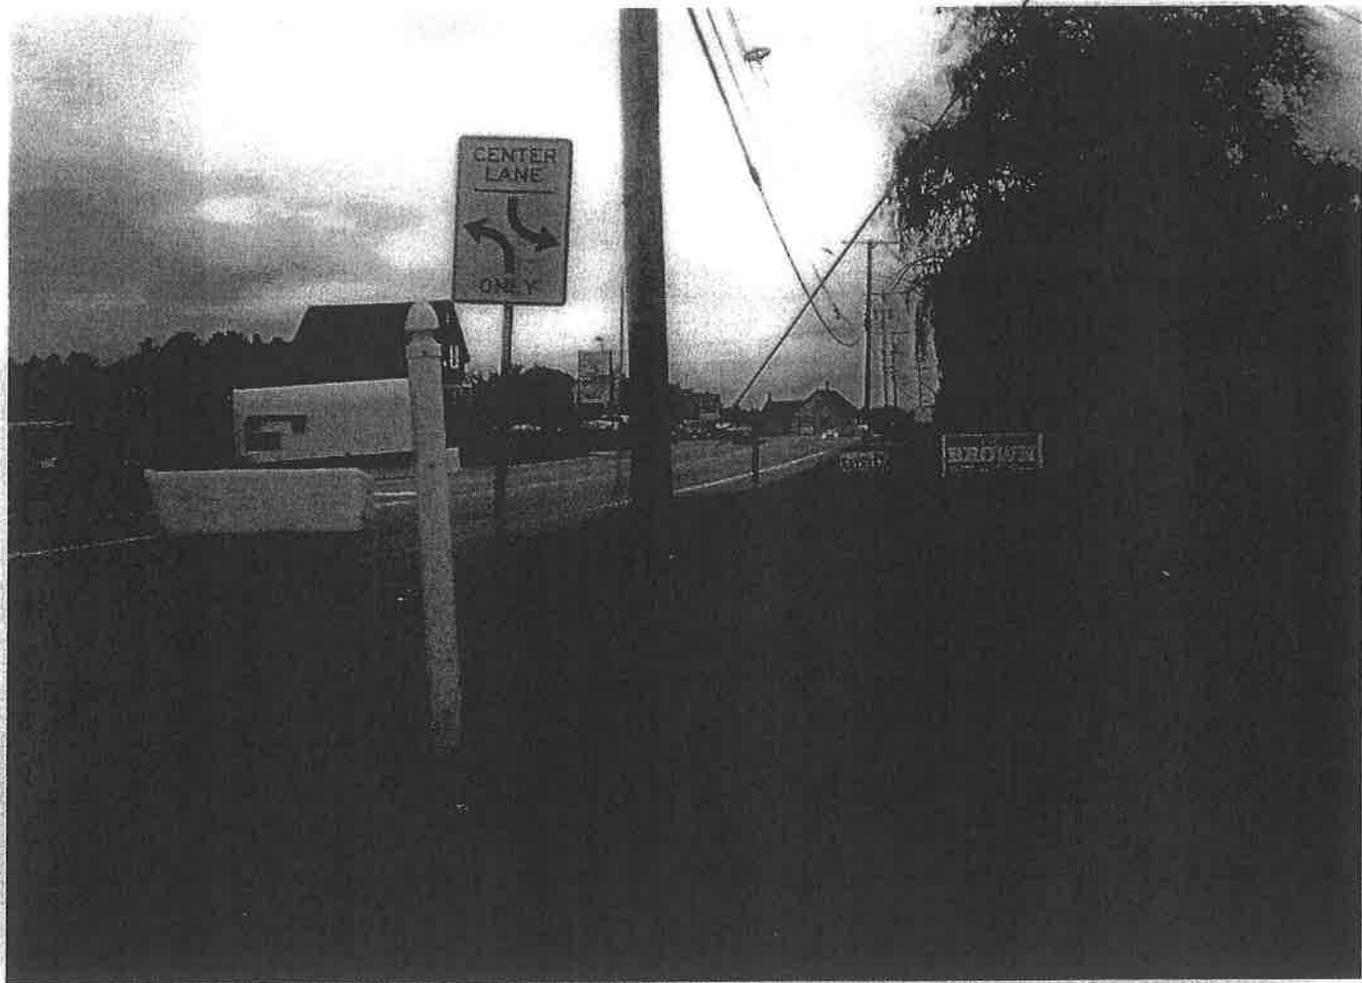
Sight distance looking north along Lowell Road toward a traffic cone, placed 400' away.
